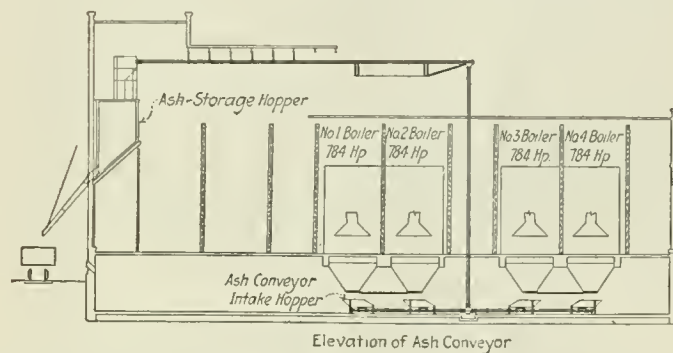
AIR CONVEYOR AT MILWAUKEE SEWAGE-DISPOSAL PLANT. ELEVATION
